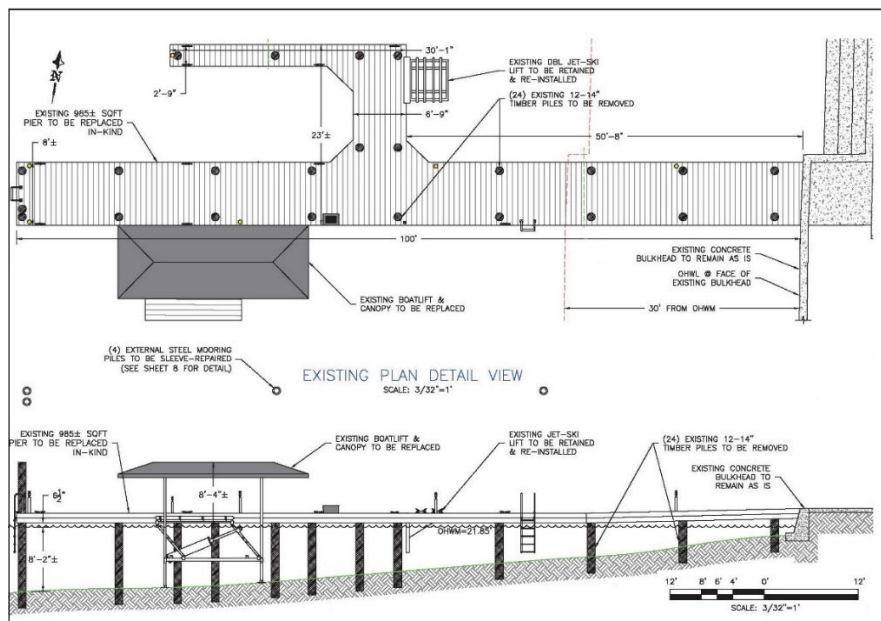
Plan drawings of the existing dock from above and in profile view (adapted with permission from Waterfront 2021c).
